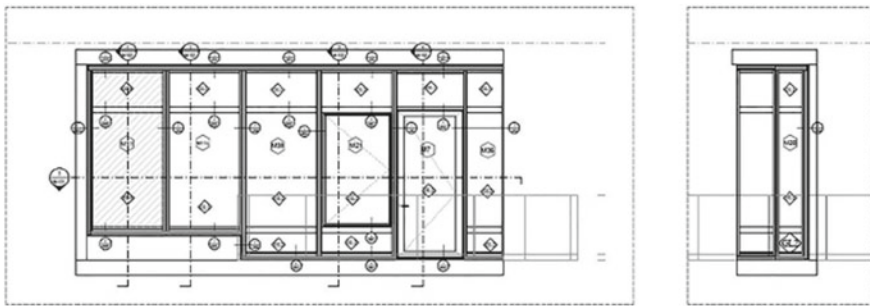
PMU—project mock-up of curved façade, elevation, and sections (Credit Glasbilt)
